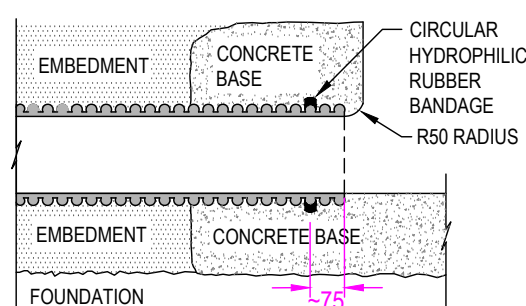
E: PP PIPE CONNECTION (SECTION VIEW)
